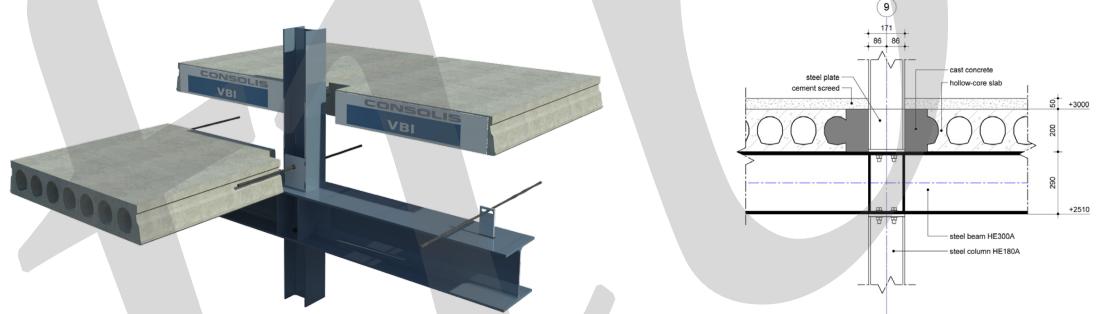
Detail of hollow-core floor to beam and column joint in the middle of the building
